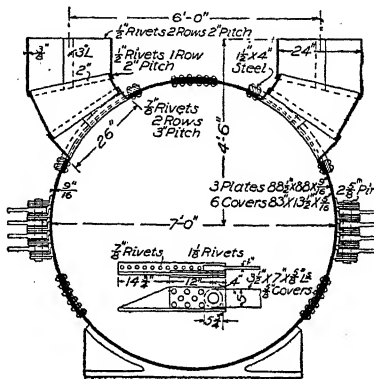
Anchor Connections, End of Penstock in Plant of Hydraulic Power Company
